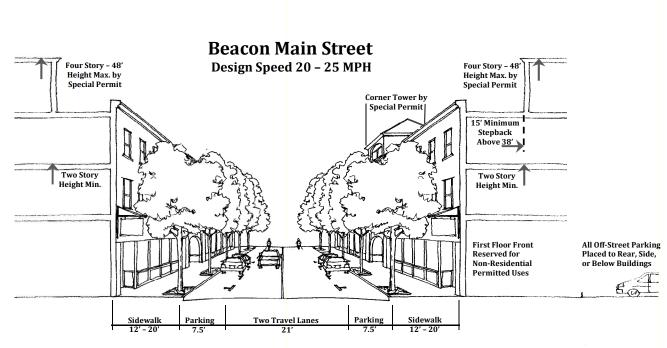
Central Main Street Zoning Requirements Illustrative View
